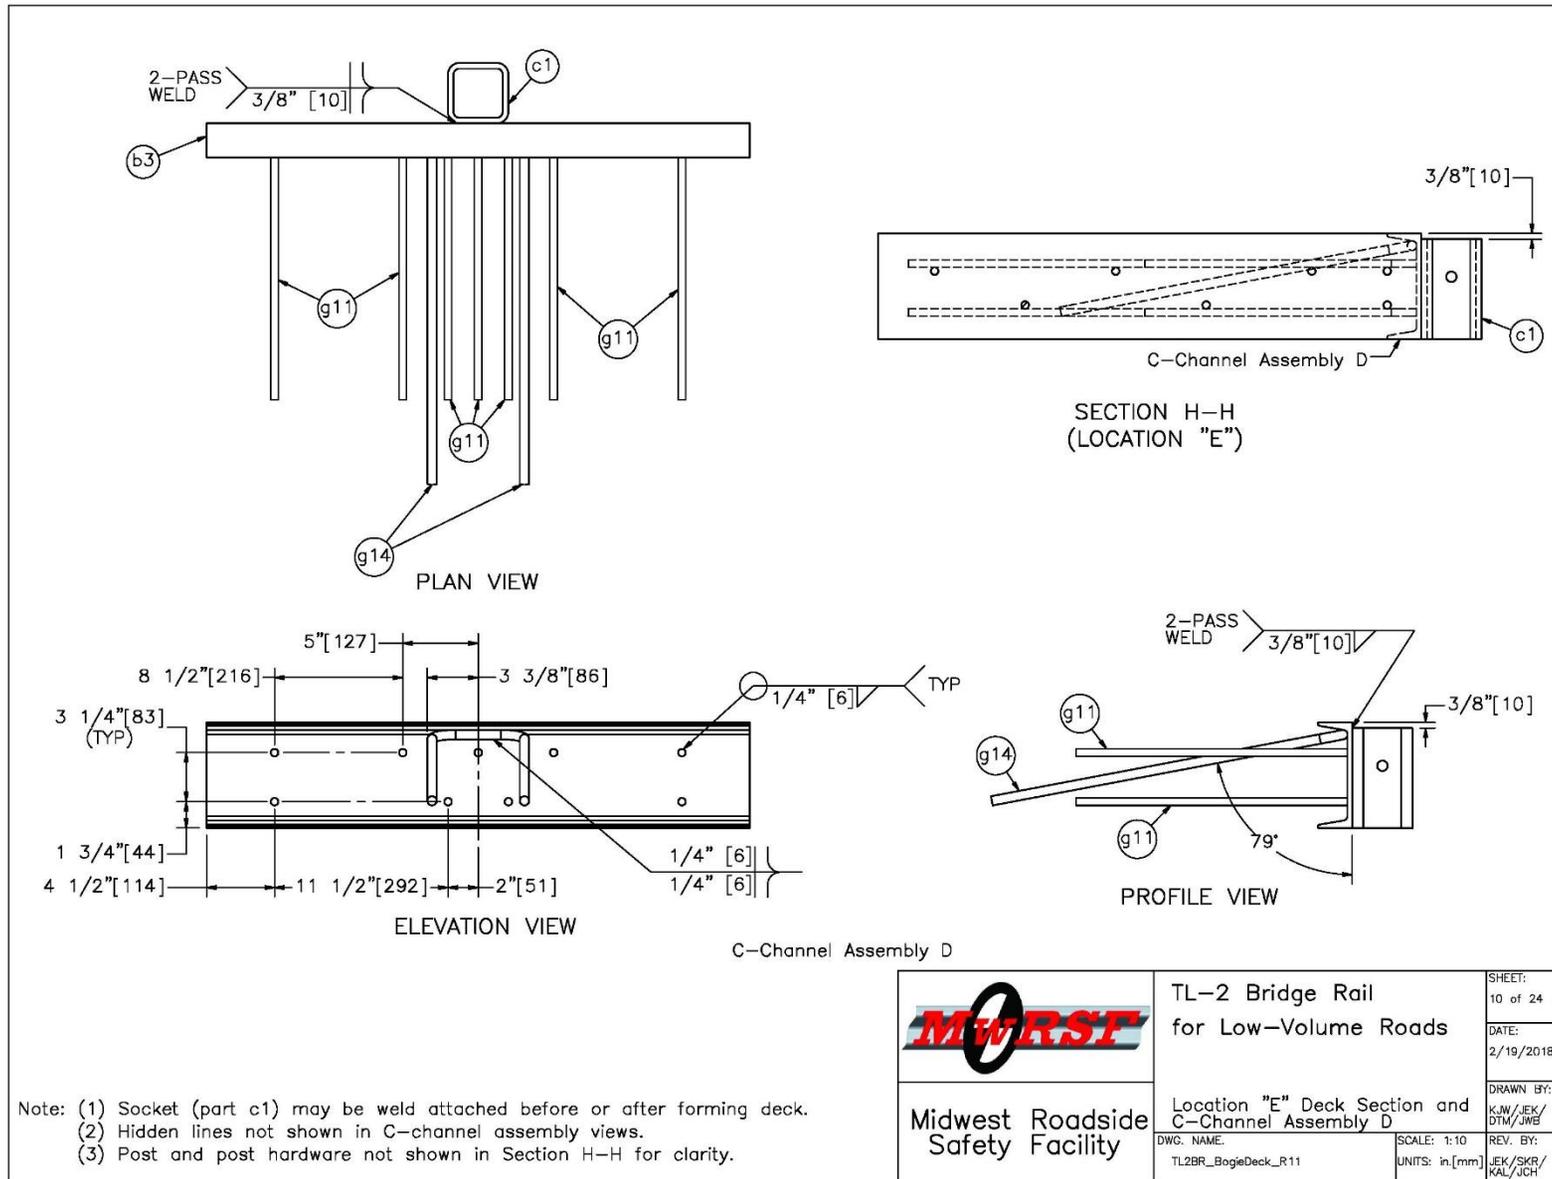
Bogie Testing Matrix and Setup, Location "E" Deck Section and C-Channel Assembly D
